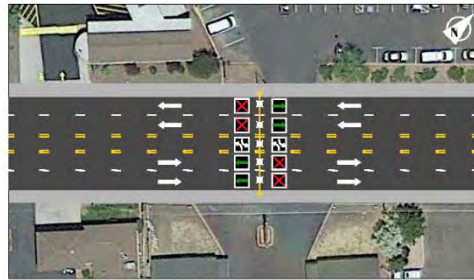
US 180 System Alternative 2 Plan View\
